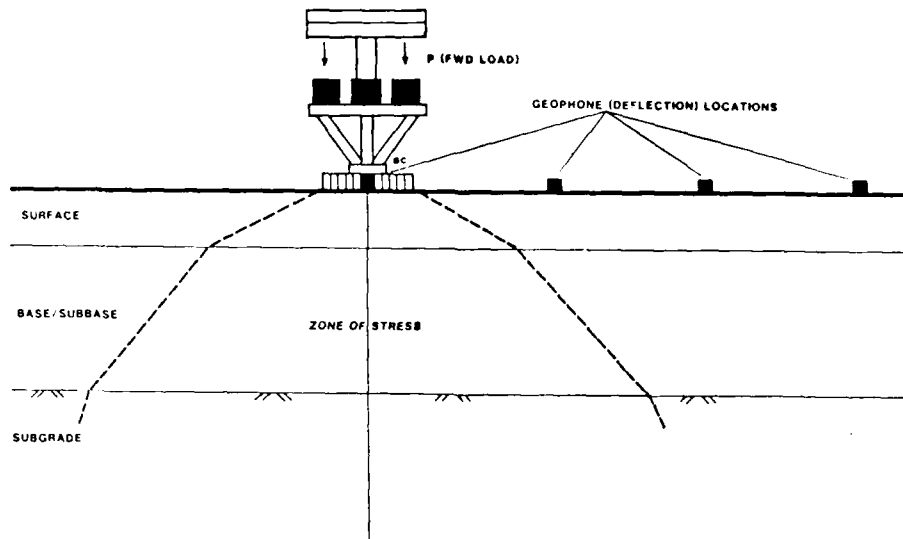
SCHEMATIC OF STRESS ZONE WITHIN PAVEMENT STRUCTURE UNDER THE FWD LOAD
